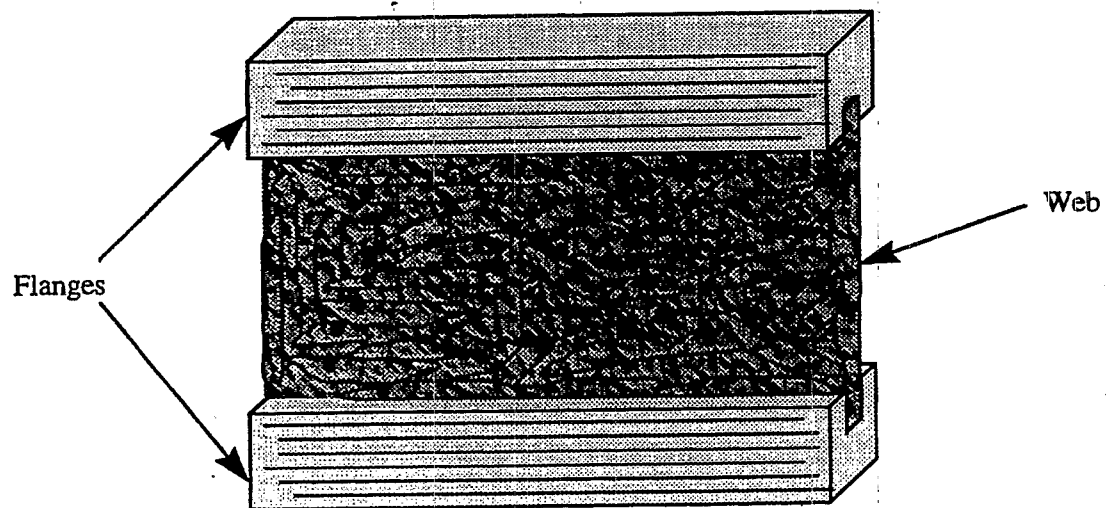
View of an I-joist made from an OSB web and LVL flanges.
